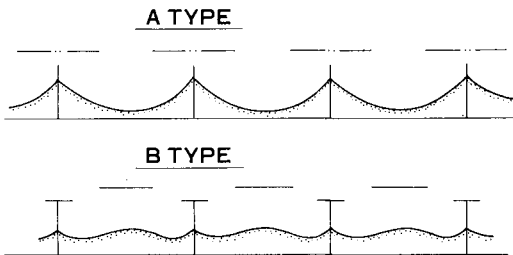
Typical layouts of structures for the protection of an artificial beach
